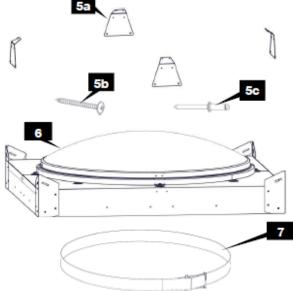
M74 DS with Cylindrical Light Collector Assembly (Add-on to M74 DS Curb Mounted Unit)
